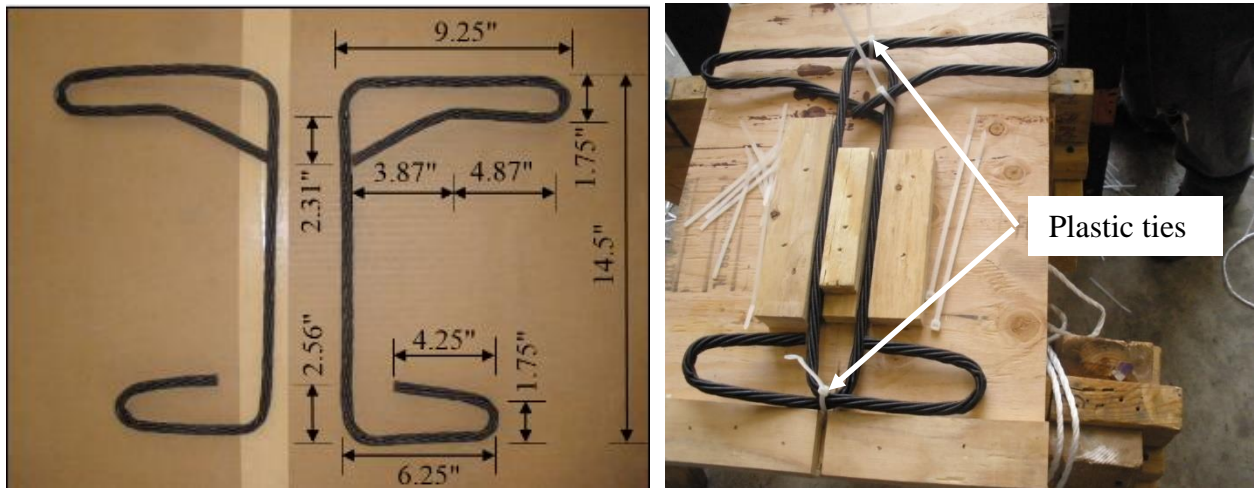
CFCC stirrups for Beam C-C-S-B
